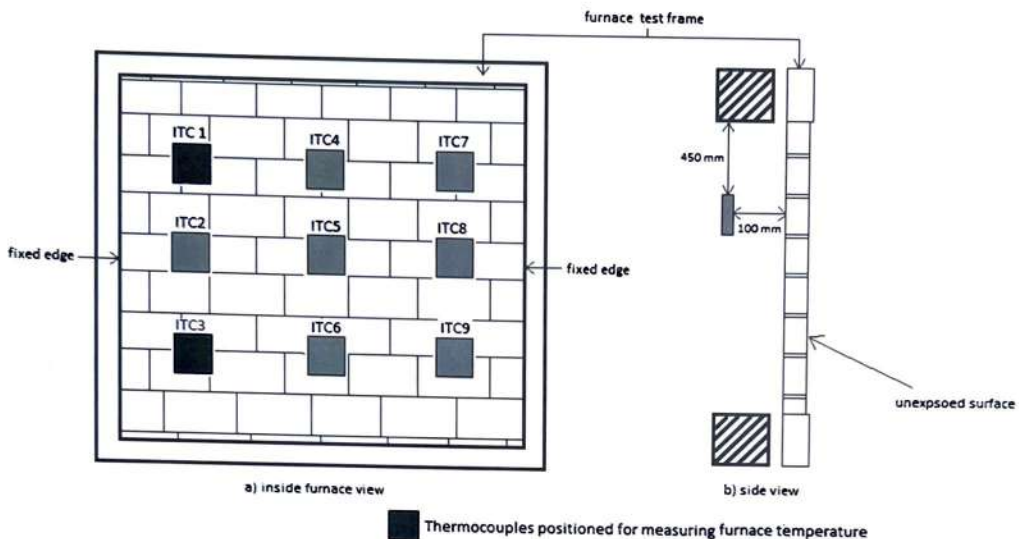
Front view of furnace showing positions of furnace internal thermocouple
